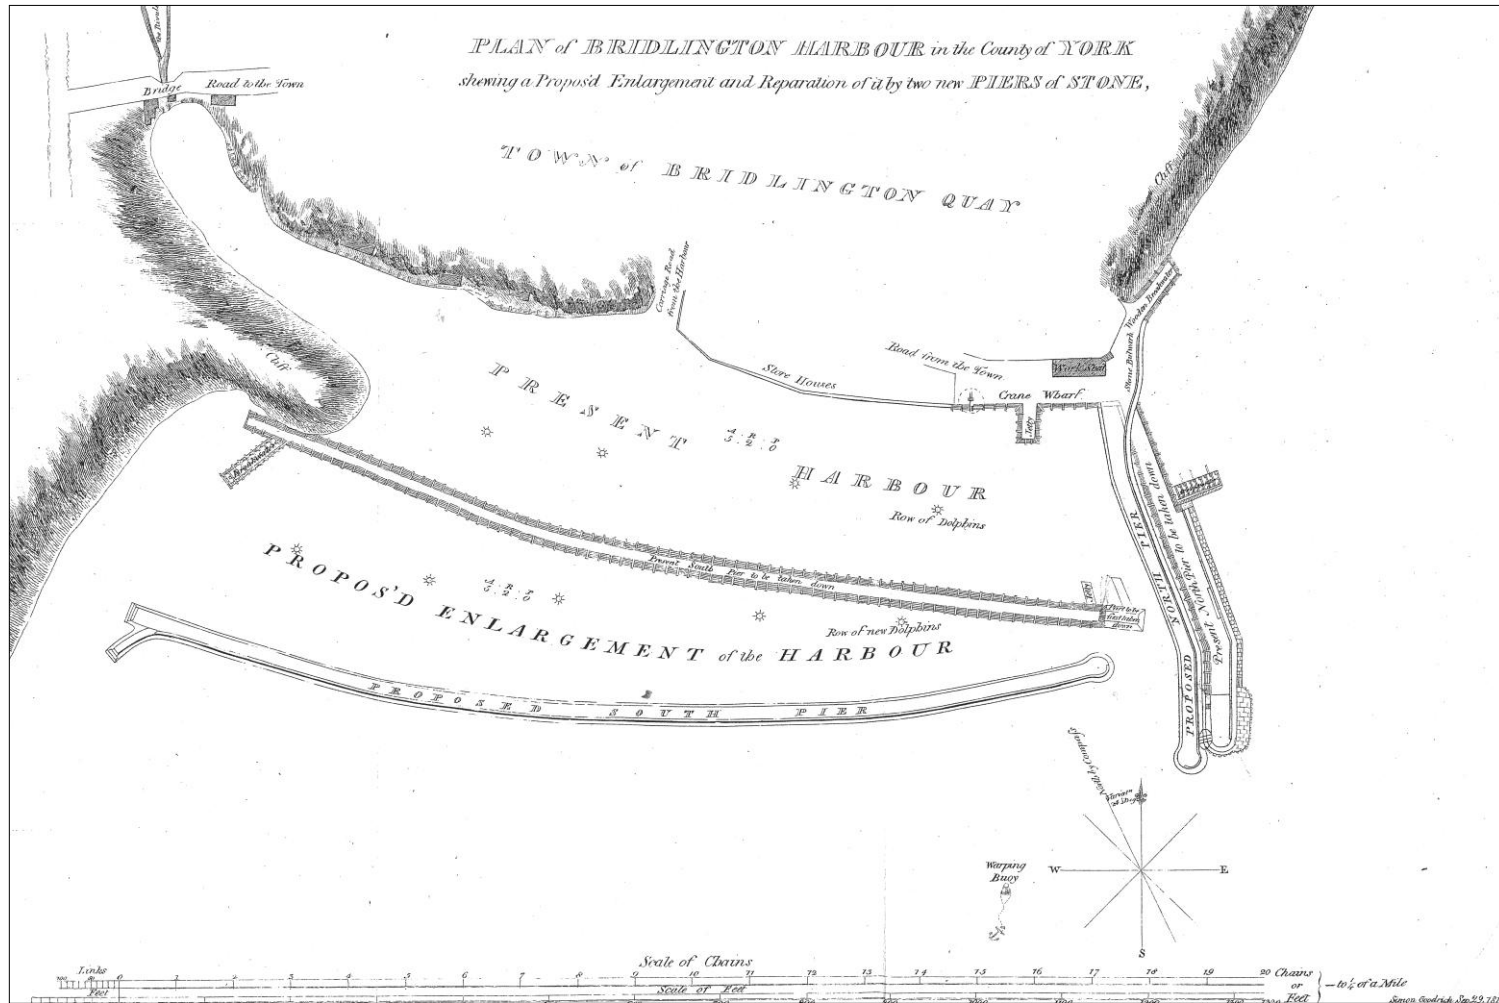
, Simon Goodrick's plan of Bridlington piers, 1814 (reproduced from Goodrick 1814)
